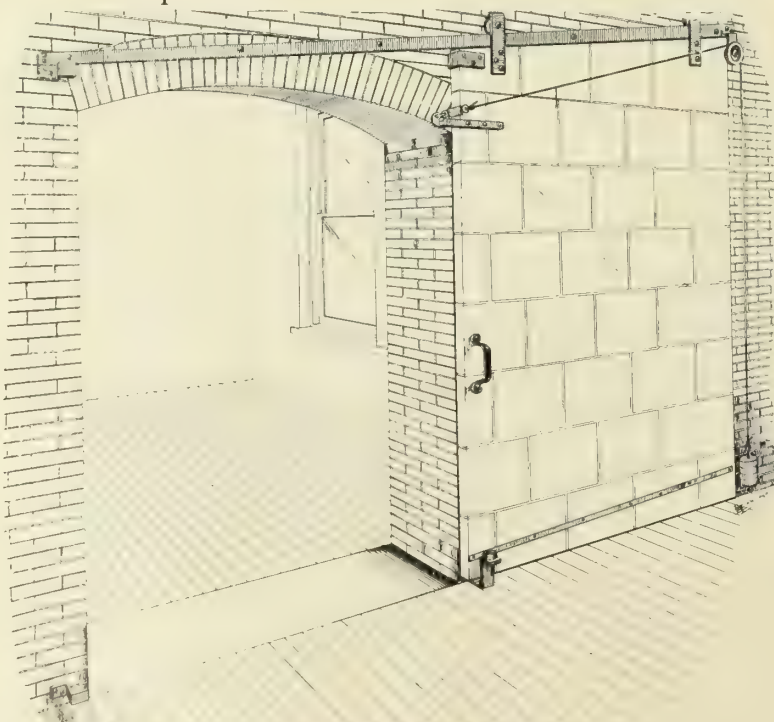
TIN CLAD SLIDING FIRE DOOR
